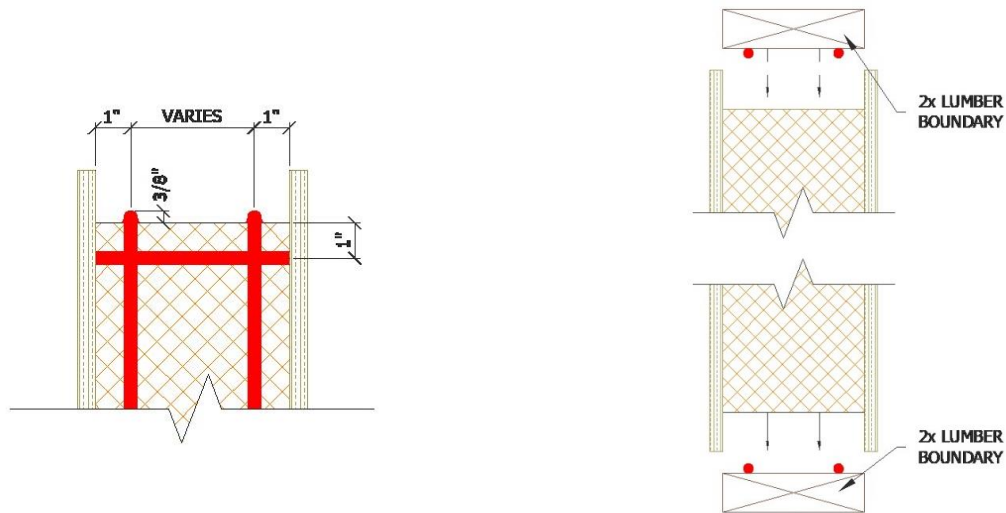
TYPICAL APPLICATION OF PREMIER SIP SEALANT
